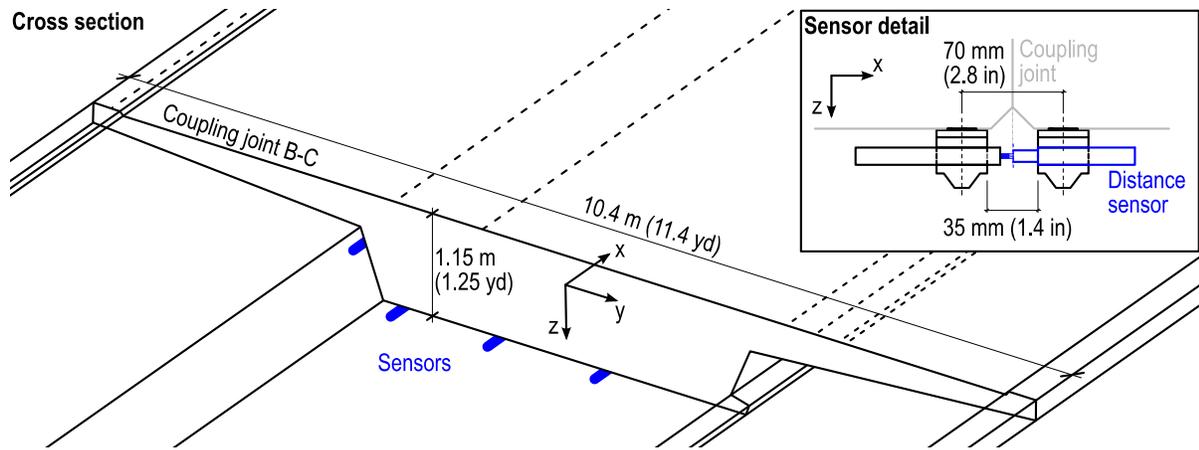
Cross section of coupling joint B-C with sensors and a detail of the application of the sensors
